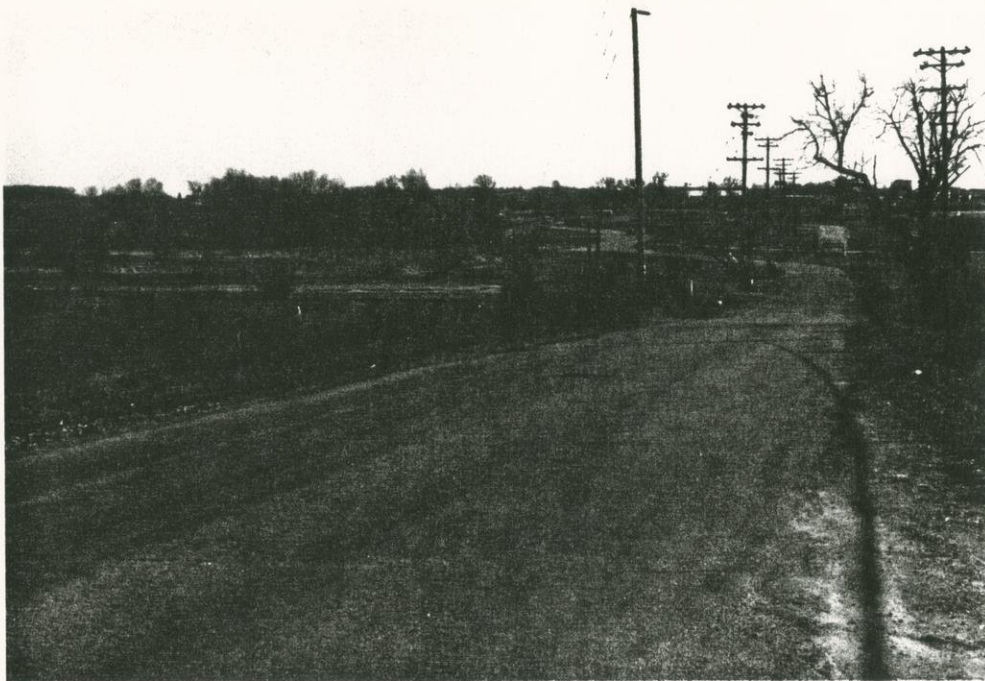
Looking south along existing Raywood Road toward railroad crossing at southwest corner of subject site.
